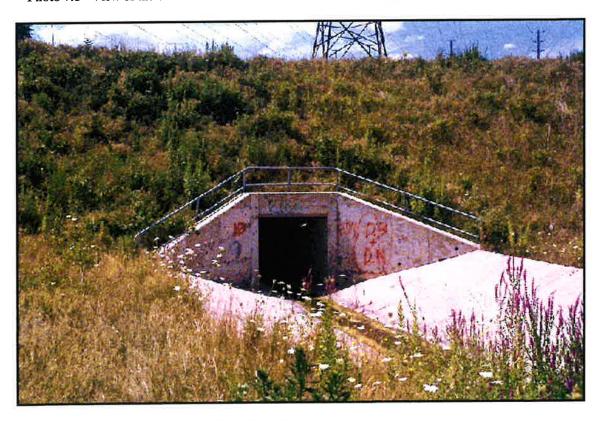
View of the upstream side of the outlet culvert and concrete transition.
